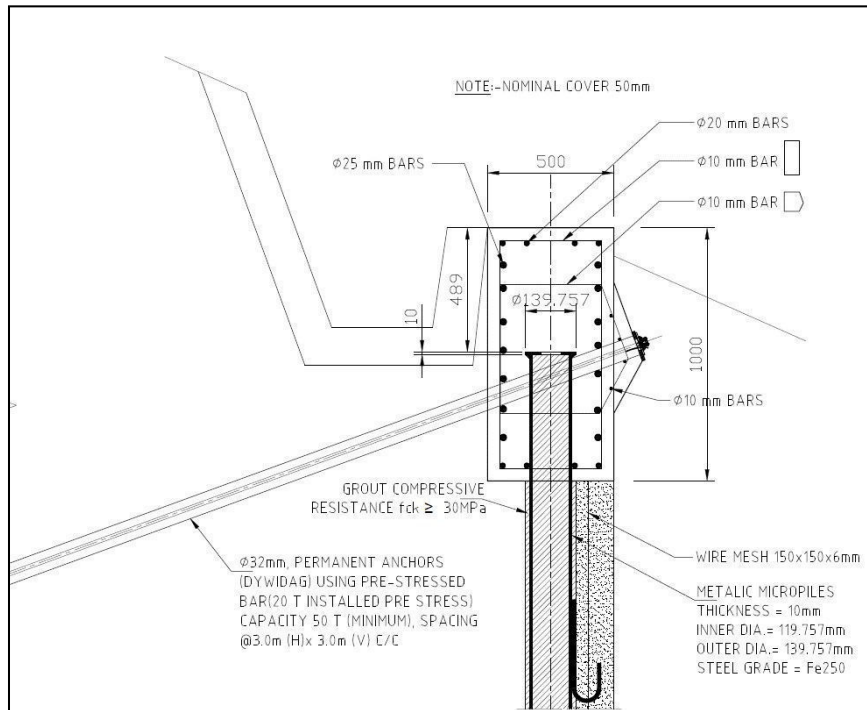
Section showing arrangement of permanent anchors through beam and details of micro-pile
